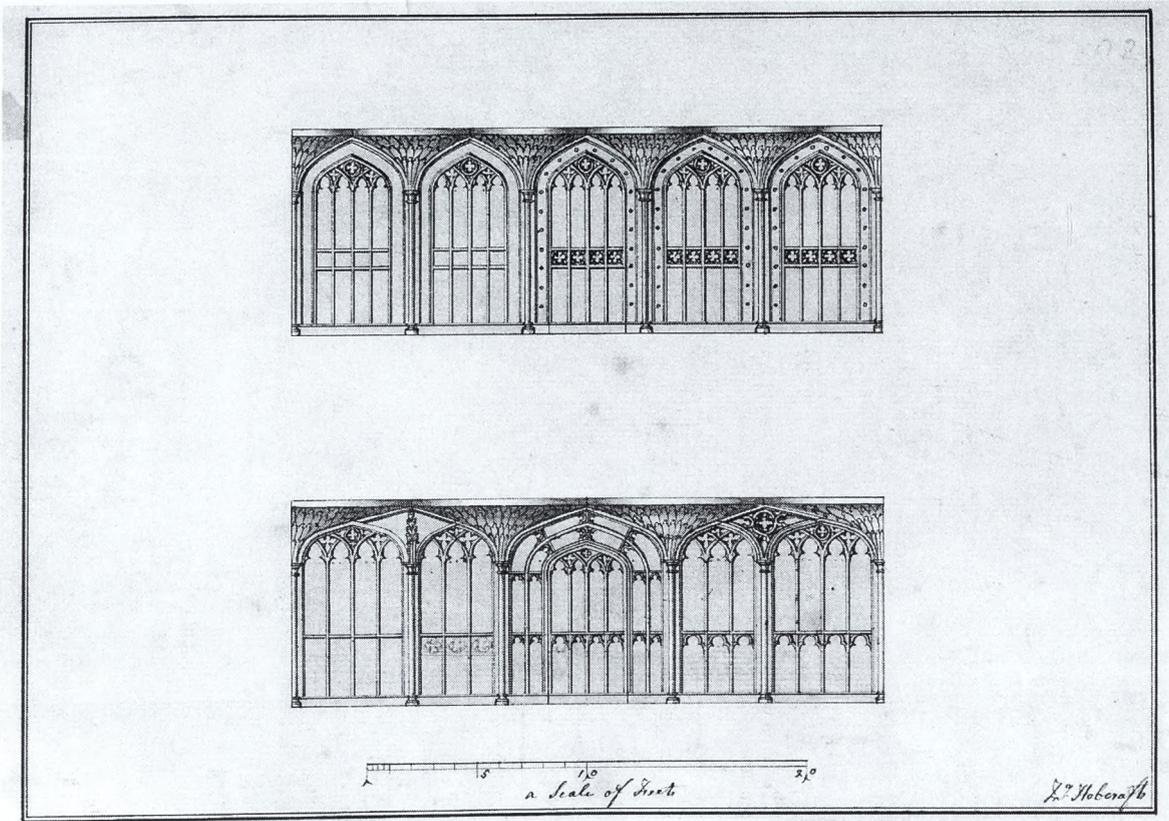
John Hobcroft, internal south elevation of proposed family pew. *English Heritage*.
